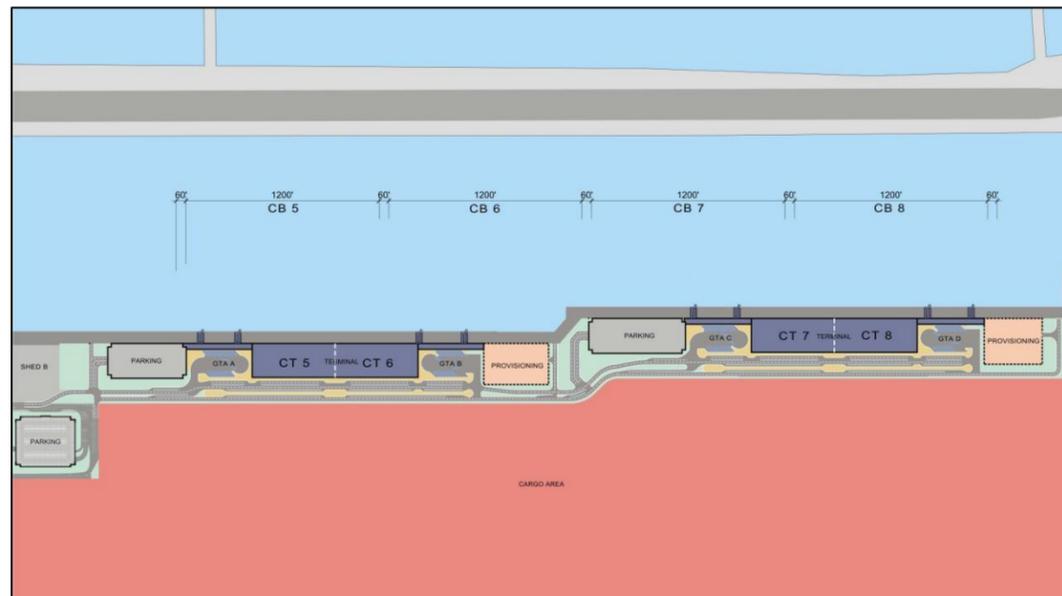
LONG-TERM PREFERRED CRUISE PLAN ALTERNATIVE
